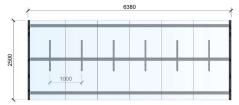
Proposed Site Plan with Ground Floor – Bicycle Storages
